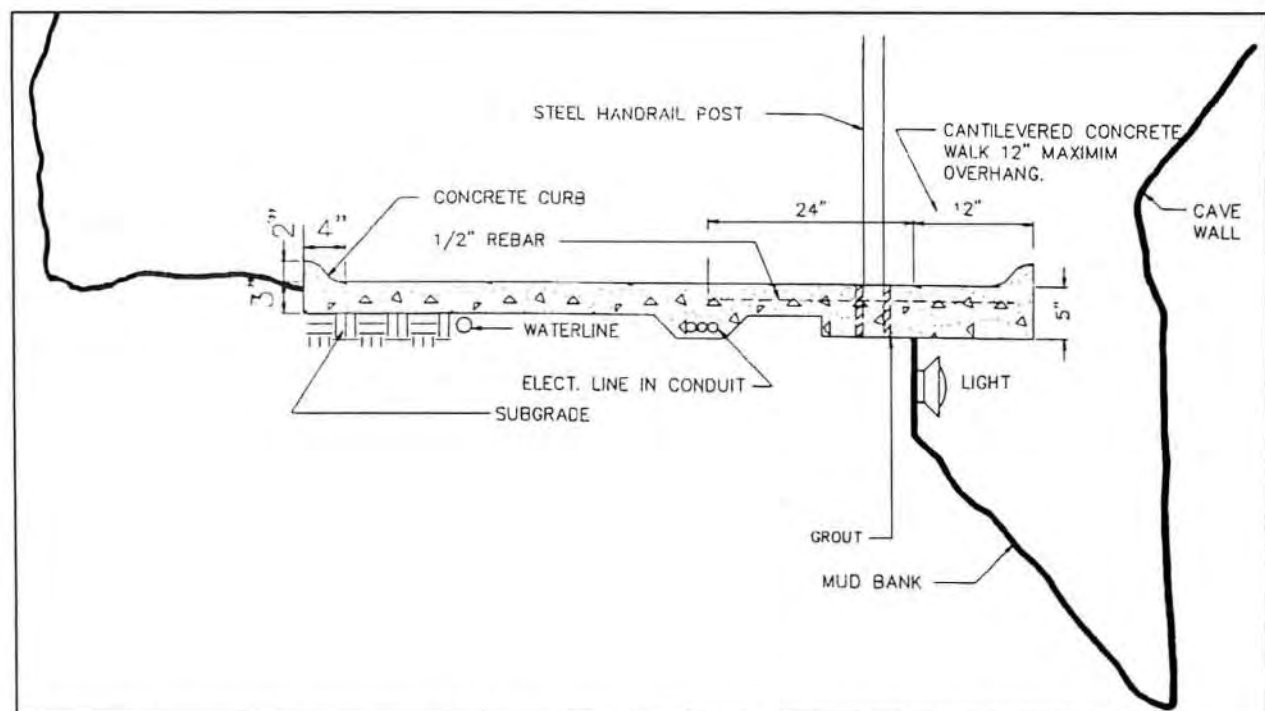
Concrete walk section showing curbs and cantilevered edge for light placement.
